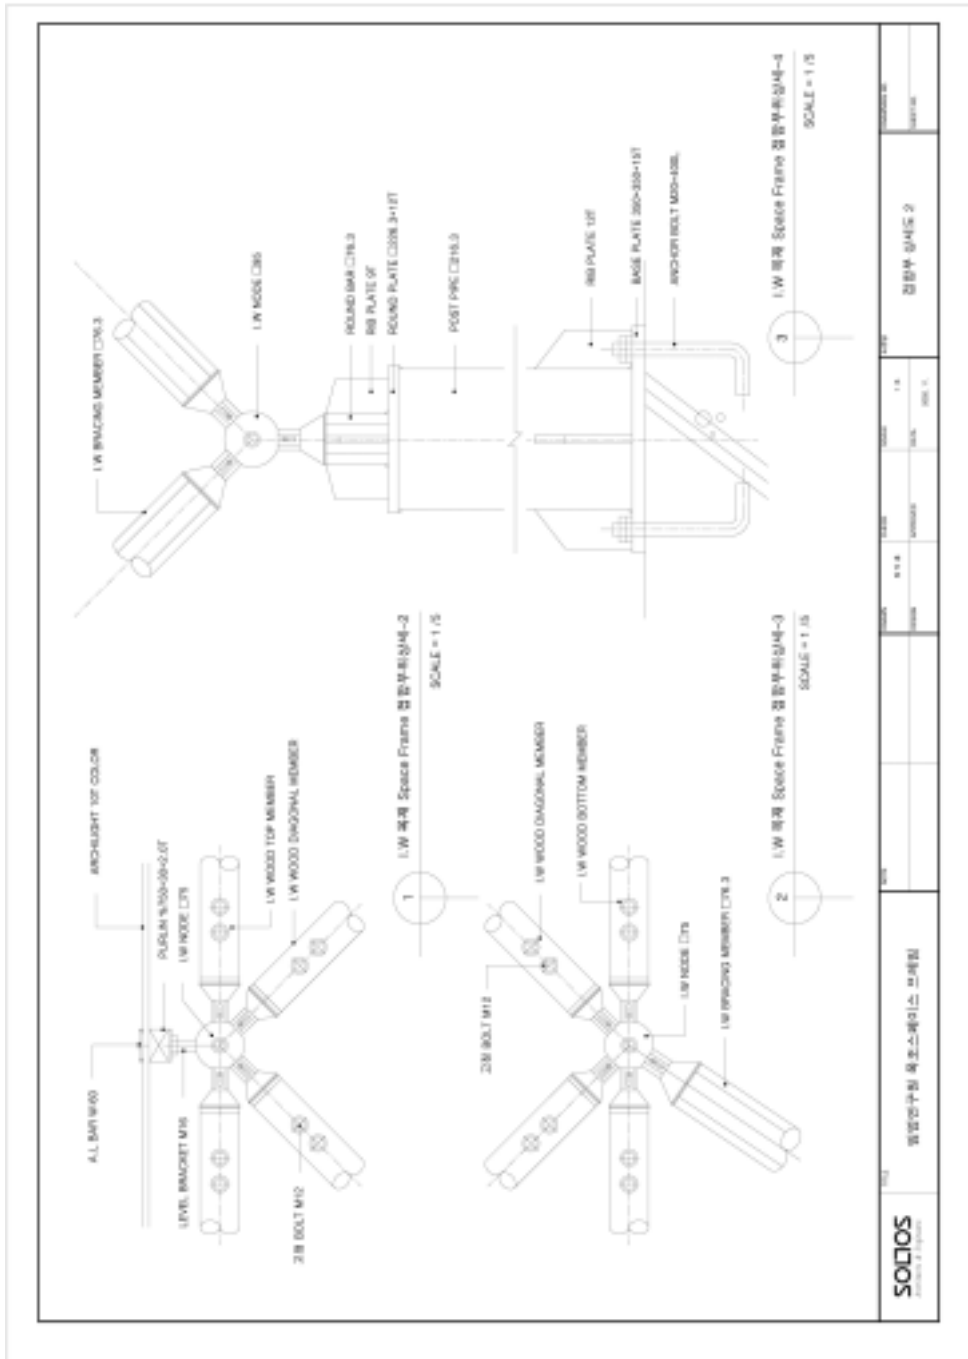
Details of connections for wood space truss structures constructed in Jungbu Forest Experiment Station
